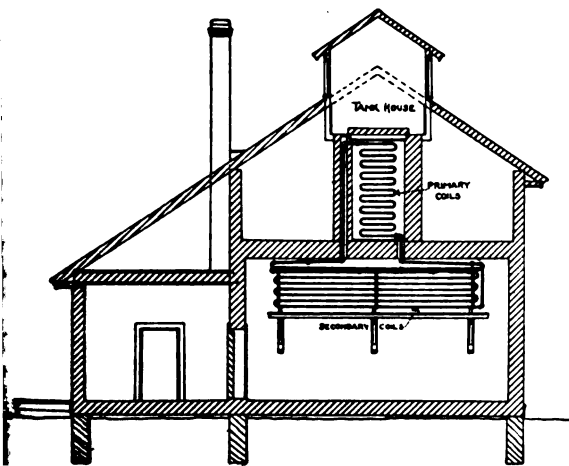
Vertical section of a gravity-brine cold-storage house.
